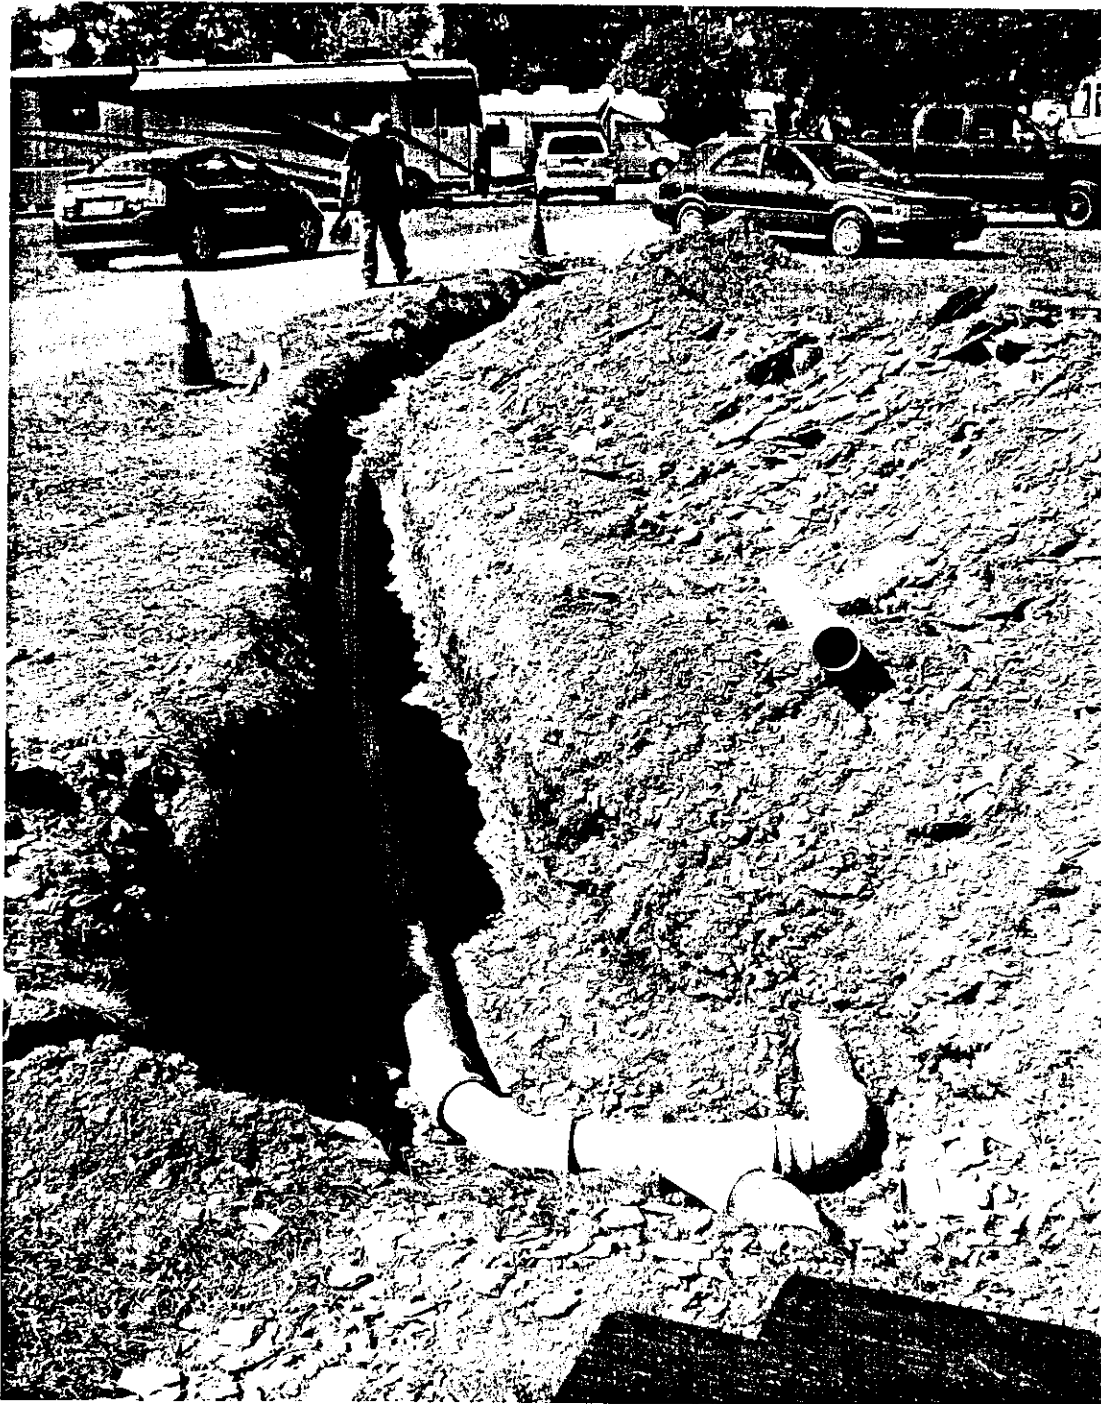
Re-routed collection System Back to Original Road Crossing.
